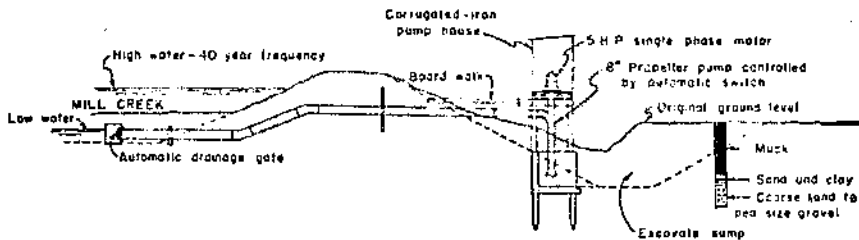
Elevation of well-designed farm pumping plant, Central La Peer Soil Conservation District, Mich.
